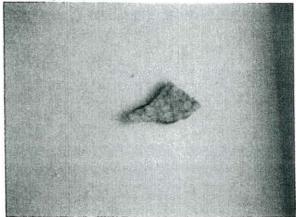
Photo of asbestos containing Pebble Sheet Floor - Beige, Samples 12A & 12B.
